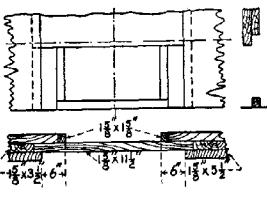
Elevation and sections of broad-edged orifice with wood gate slide and guides.
